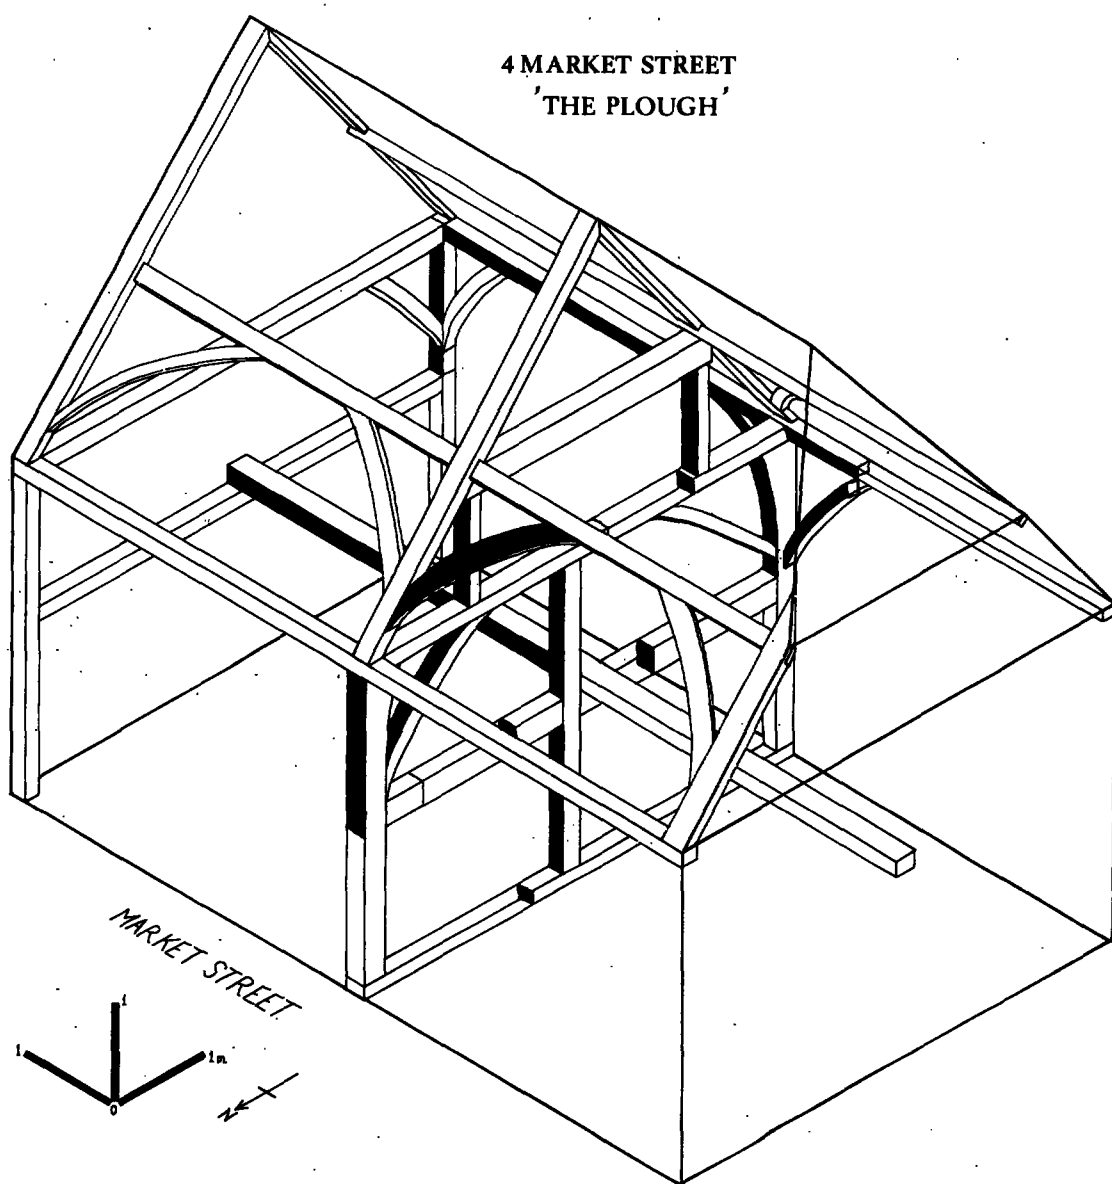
Johnson's Corner: isometric reconstruction drawing of no 4 Market Street. Surviving timbers are shown with solid black on one side.
